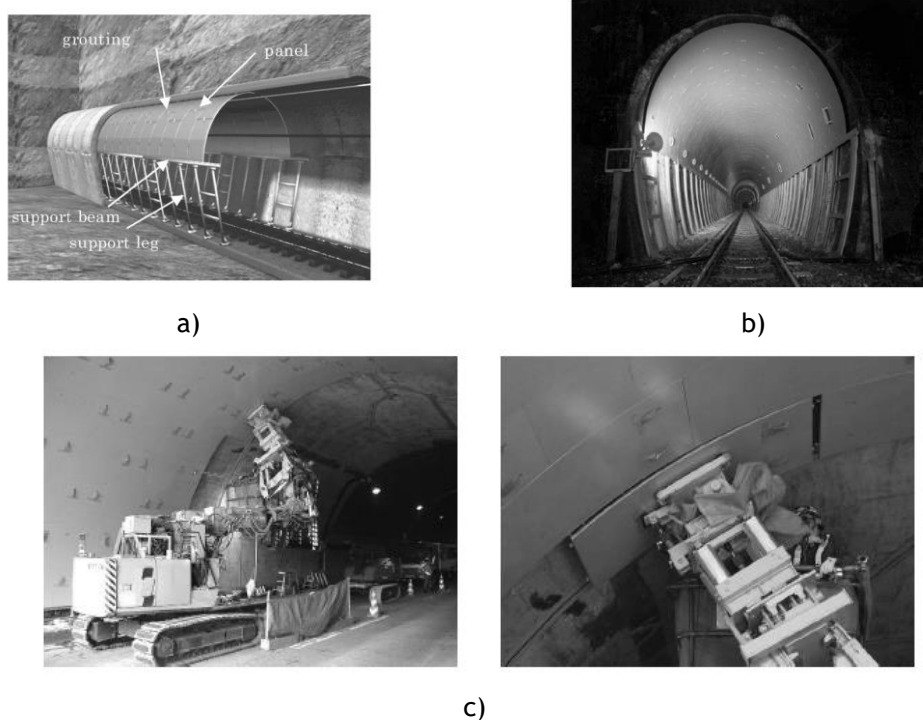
Tunnels reinforced by steel panels; a) basic structure, b) a reinforced railway tunnel and c) panel installation by the electric machine [144].
